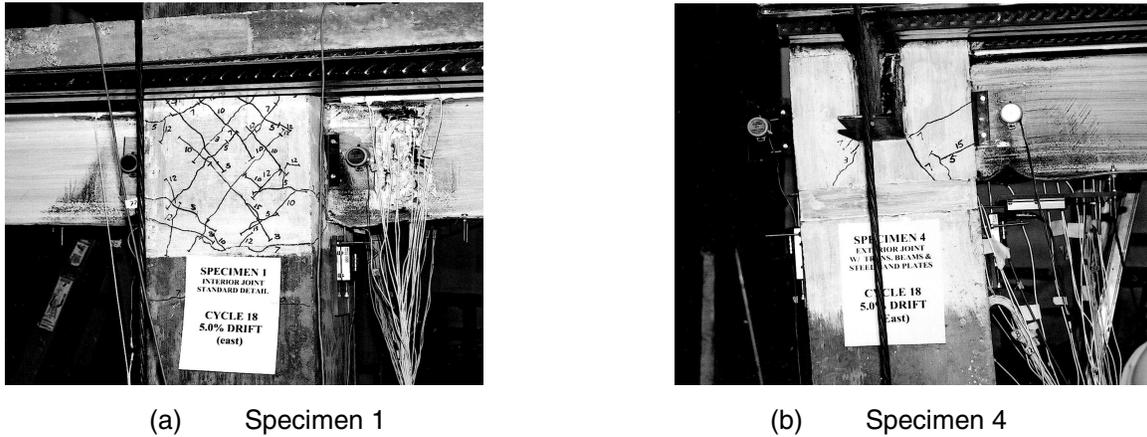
Joint Cracking and Beam Yielding in Test Specimens at End of Tests
